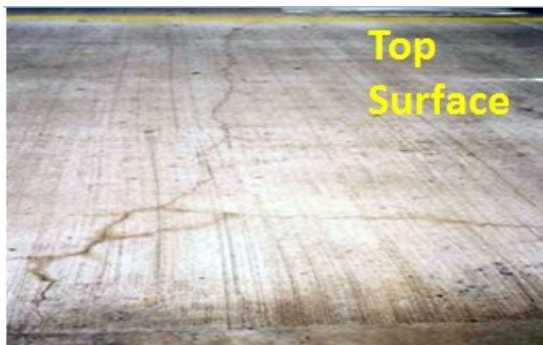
Early age transverse cracks initiated by thermal stress and shrinkage externally restraint by steel girders[5]
